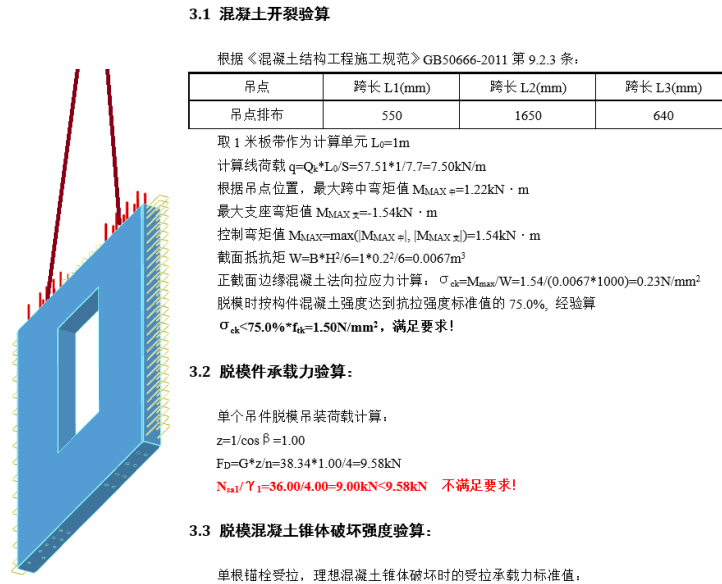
Some part of the calculation content for wall hoisting in YJK's built-in prefabricated building design software
